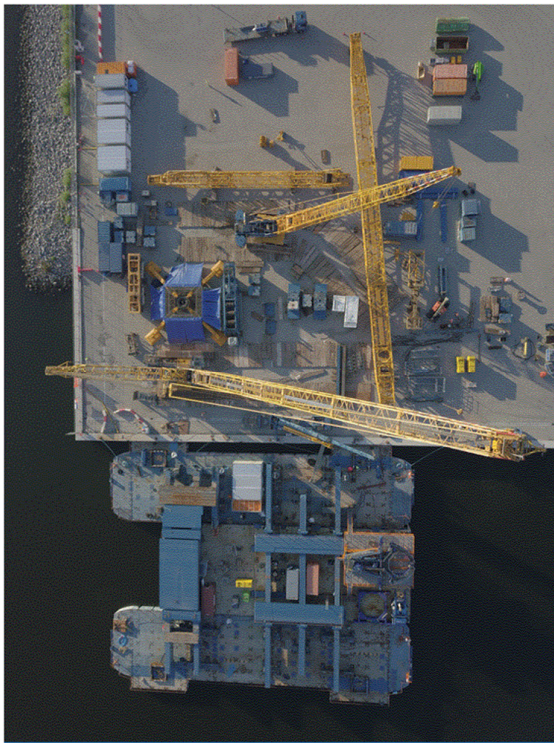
Top view of the CAB during its rigging, right before the installation of the PC 6800-1 crane.
